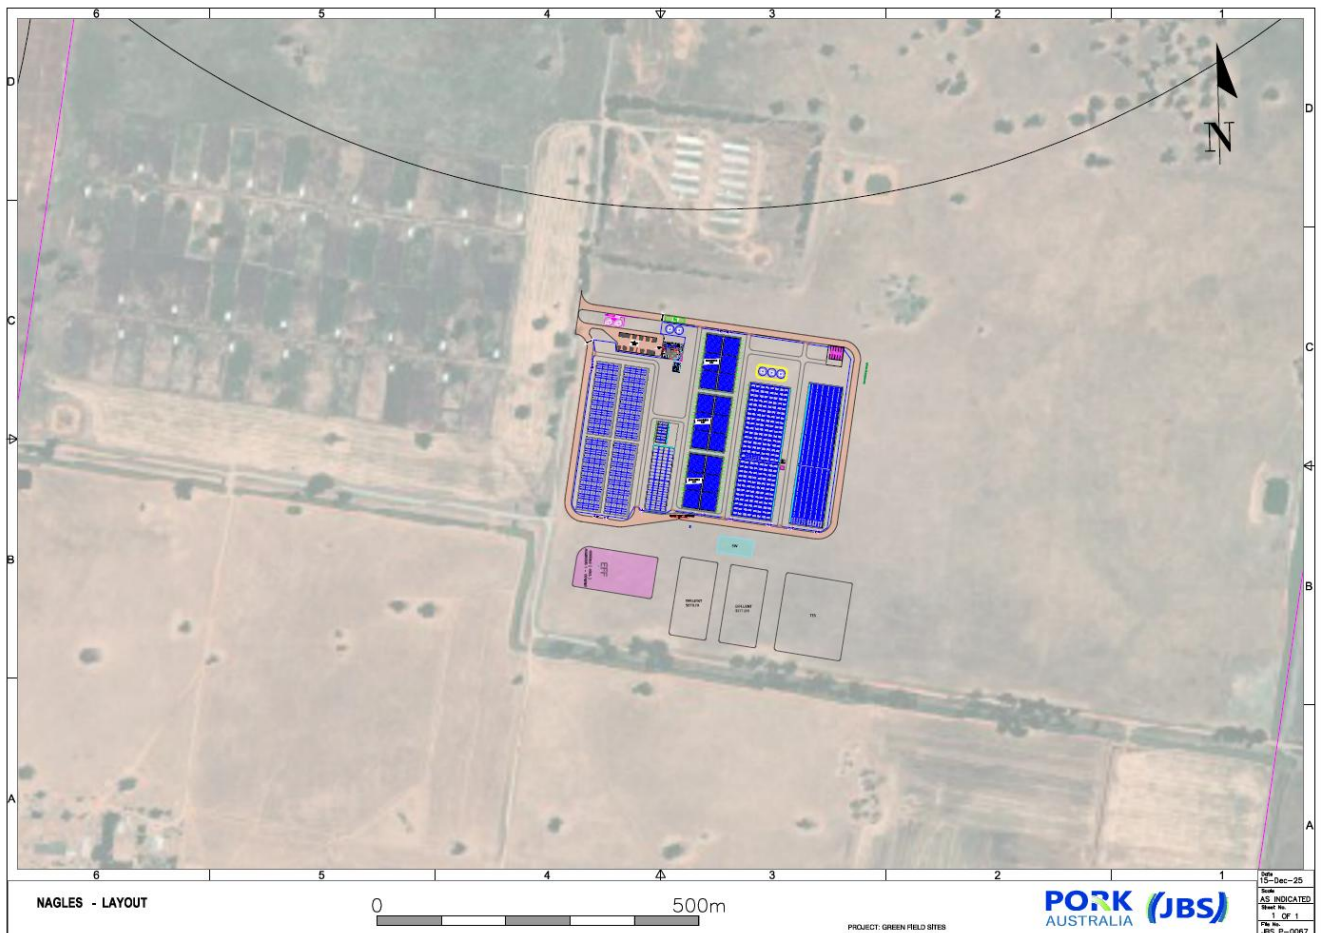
Preliminary Site Layout Plan on aerial base (JBS, 2025)
